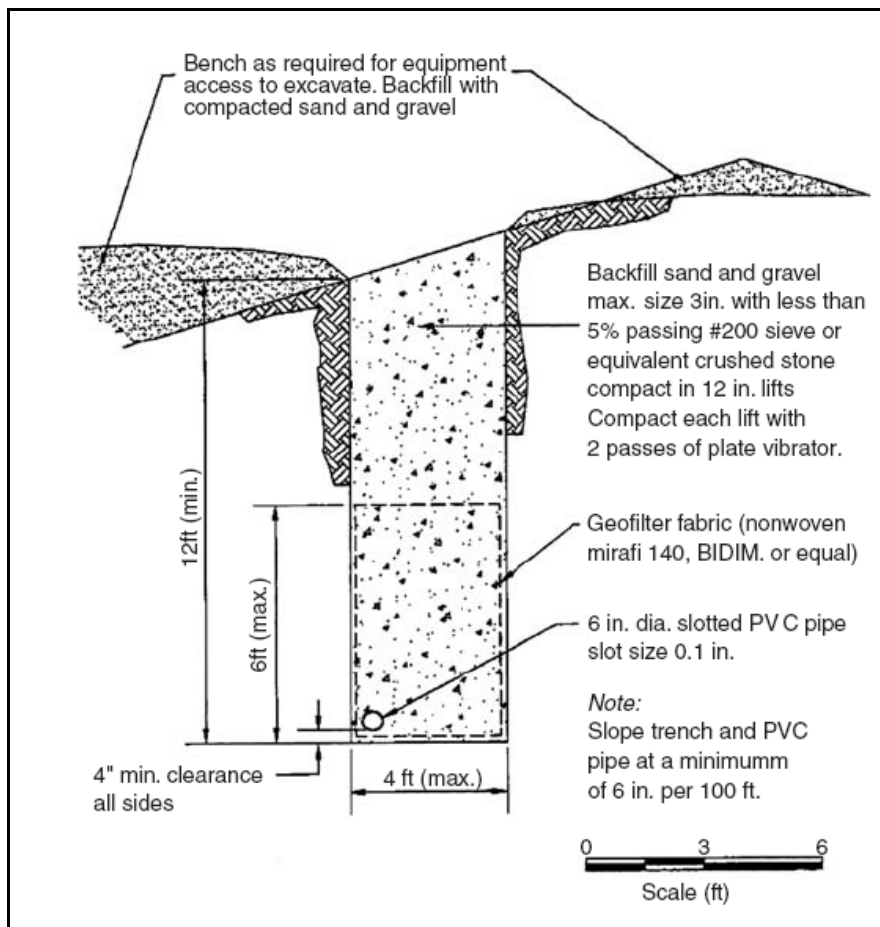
Typical slope trench drain (Hunt, 2005)
